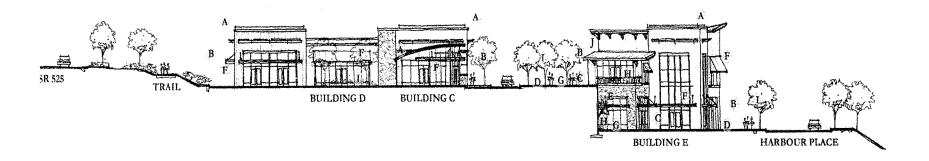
Building Cross Sections for Sector 3 - Mukilteo Town Square
